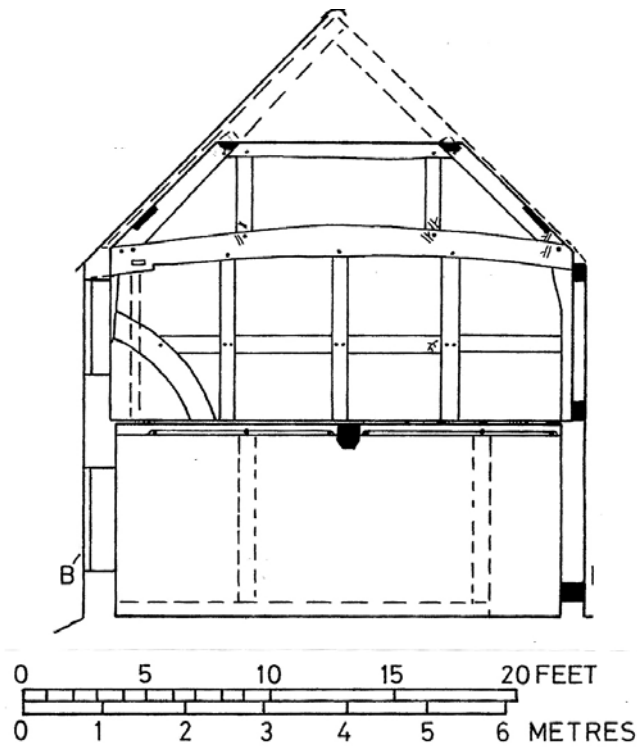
A section showing the same frame at Abbey Farm Cottages, Mottisfont with dotted lines indicating the recessed wall beneath the missing wall plate (drawing by Linda Hall).
